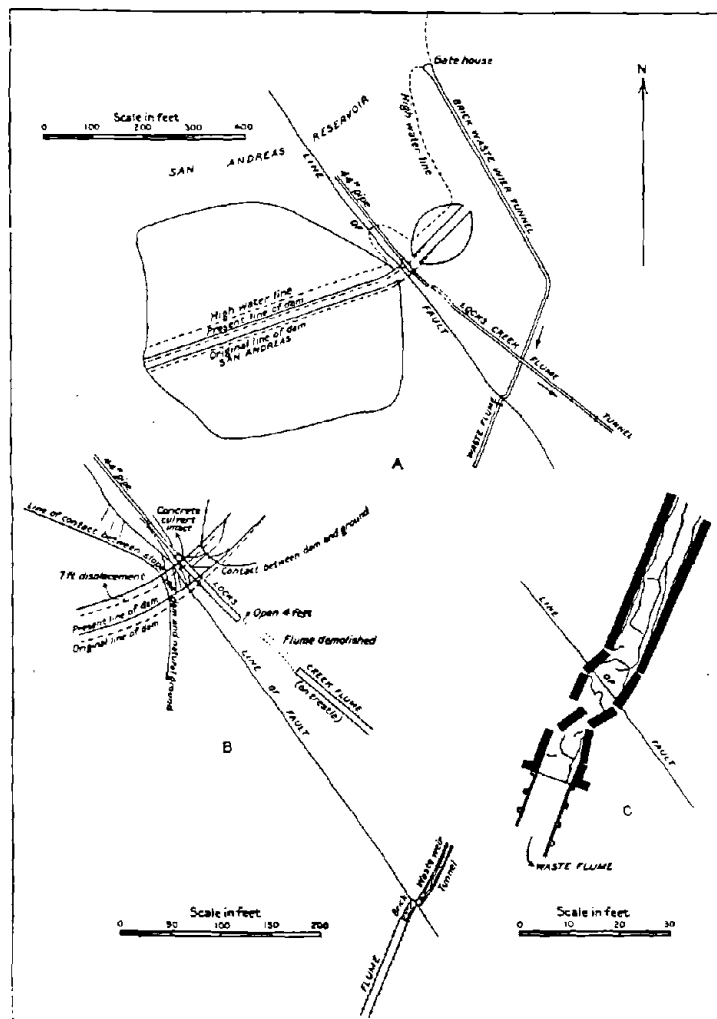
SAN ANDREAS DAM: PLAN VIEW SHOWING INTERSECTION BY FAULT AND CROSS SECTION (after Lawson, 1968 and Schussler, 1909)
